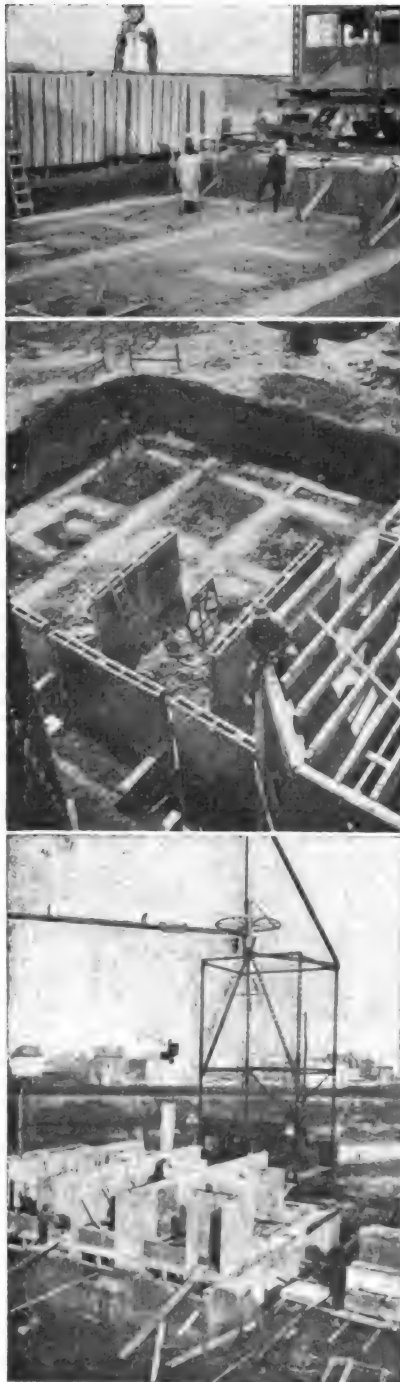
SUCCESSIVE VIEWS OF BUILDING OPERATIONS WITH CRANE PLACING UNITS
